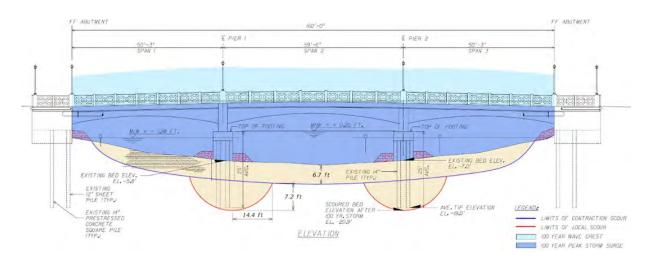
BRIDGE STORM SURGE, WAVE CREST AND SCOUR ELEVATIONS
